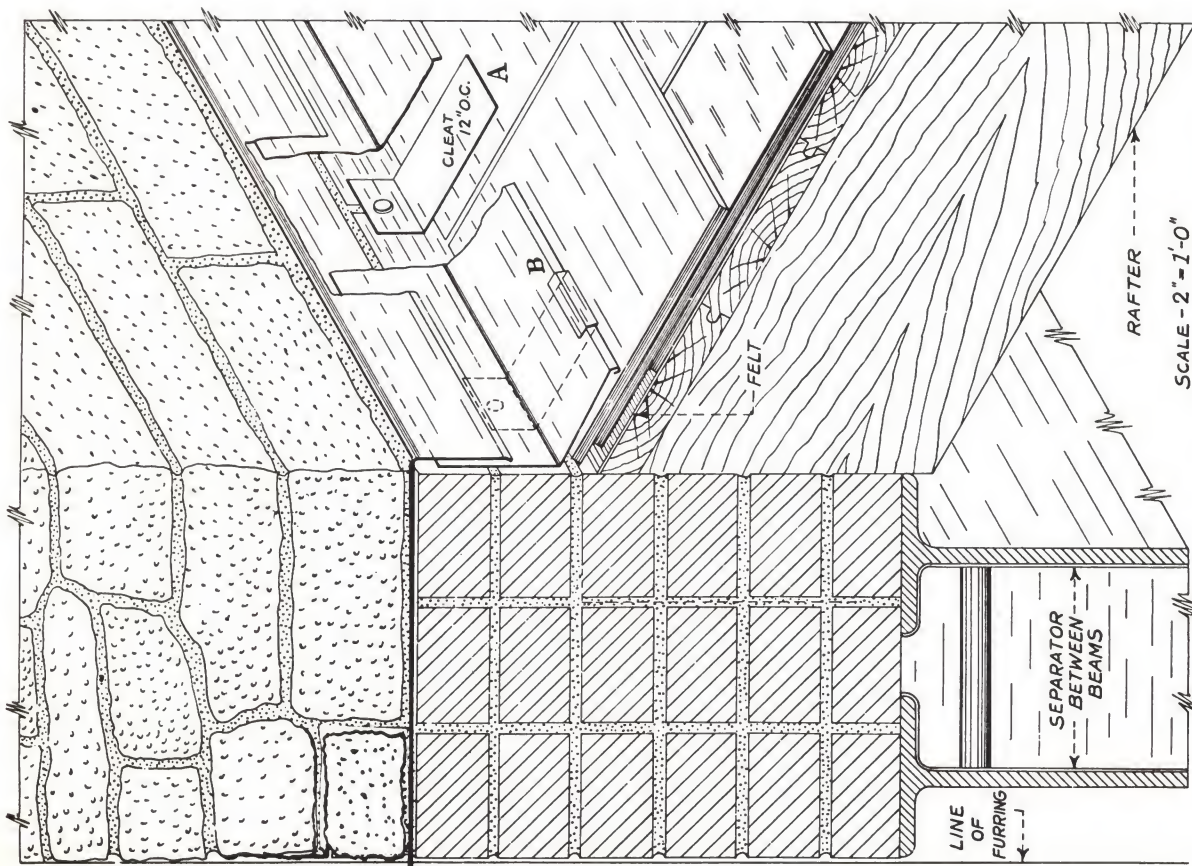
METHOD OF APPLYING CAP AND BASE FLASHINGS AT WALL ABUTMENT
